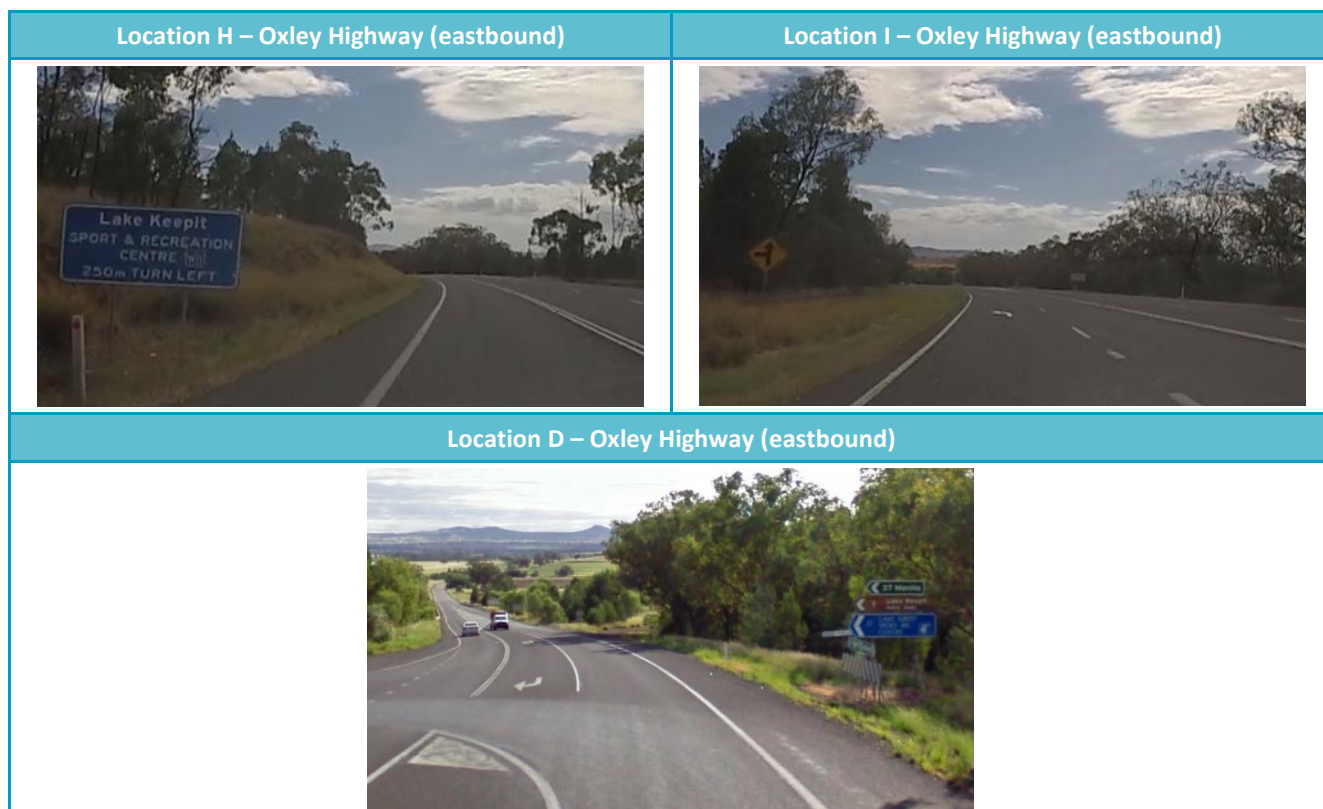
Oxley Highway/Rushes Creek Road - Existing Intersection Form and Signage
